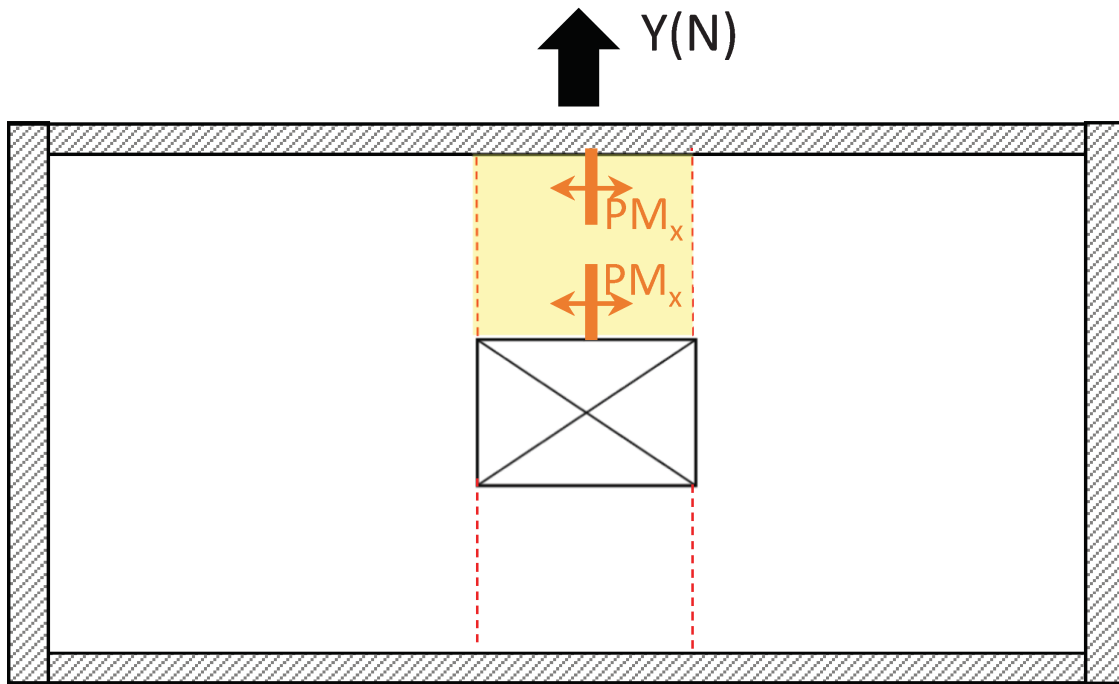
Section cut locations to determine chord forces in one diaphragm segment generated by an opening
